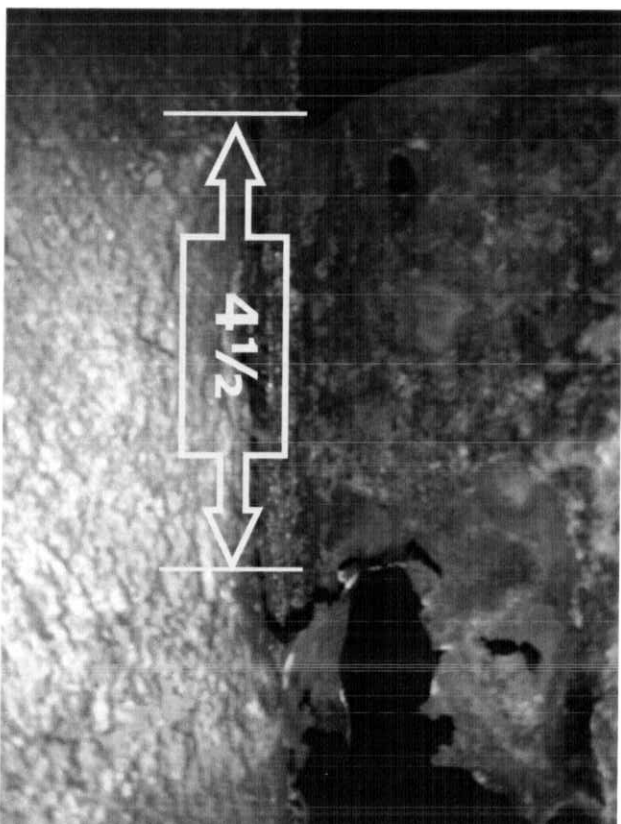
UNDERSIDE OF FLANGE OF BEAM # 5 IN SPAN # 1 AT PIER.
